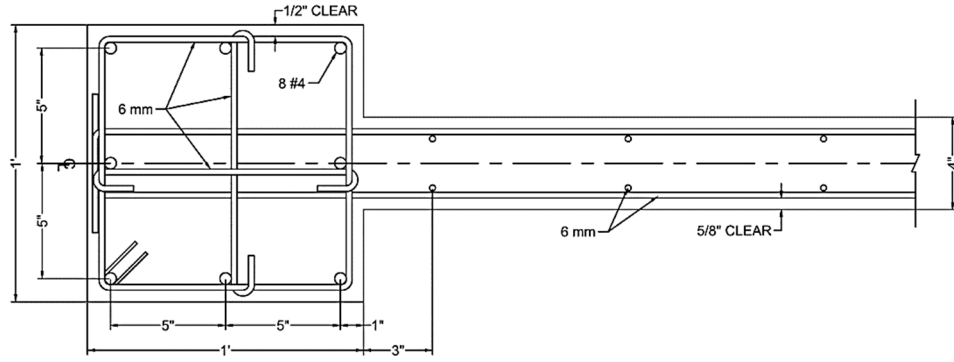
Shear Wall Specimen B3 and B4 – Cross Section (Oesterle et al. 1976)
